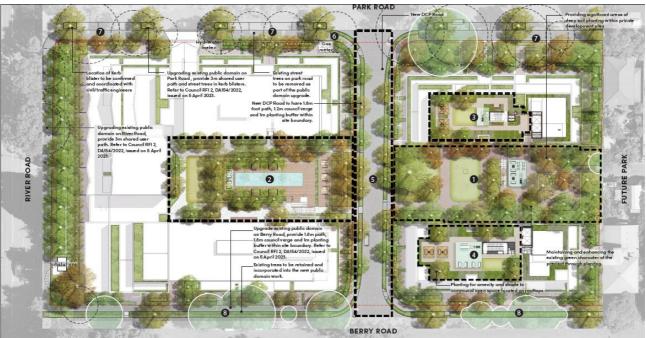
Overall Landscape Plan (Source: turf/Clouston).
